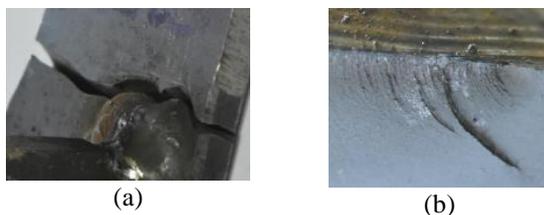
Visualization of the crack in the upper beam: (a) bottom view; (b) fatigue fringes.
